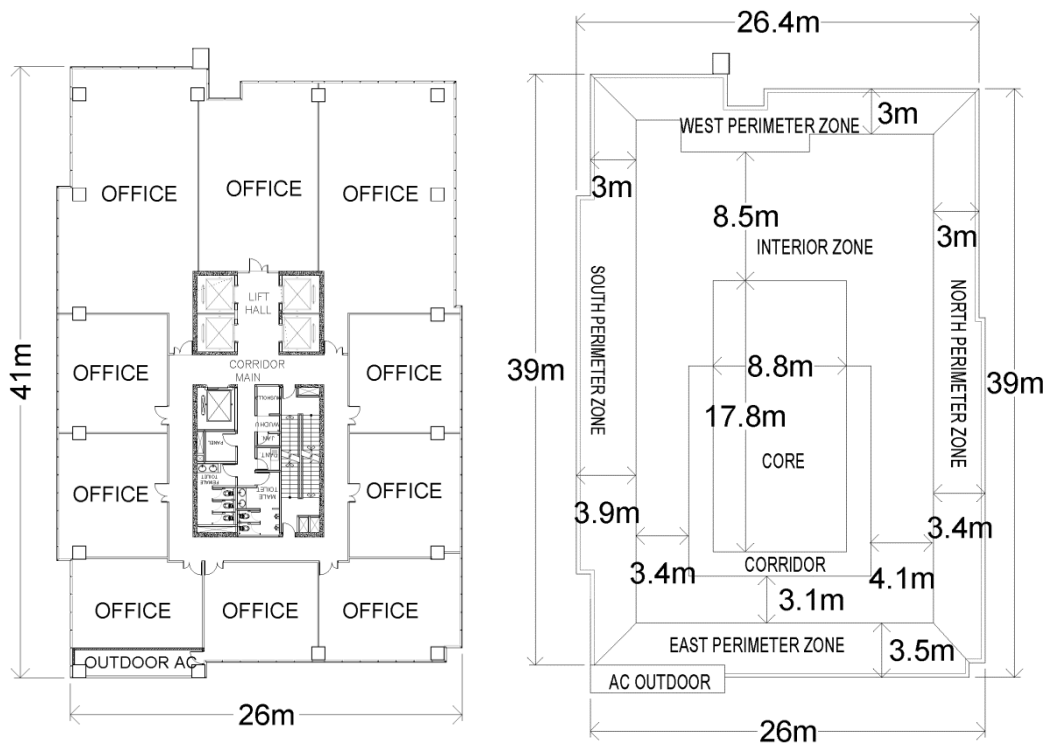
Plan view of typical floor 10th ~ 19th and its zoning
